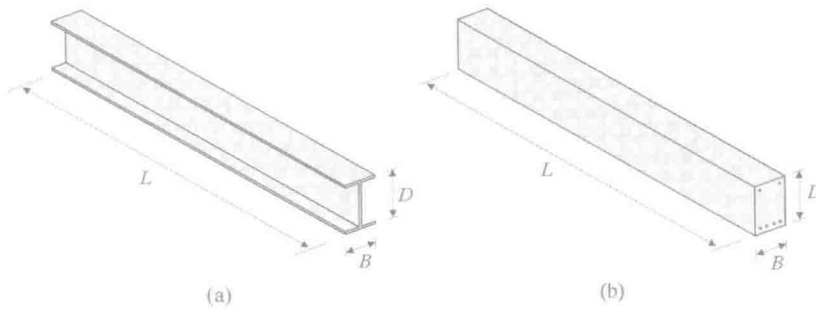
One-dimensional (line) elements. (a) Structural steel. (b) Reinforced concrete.
